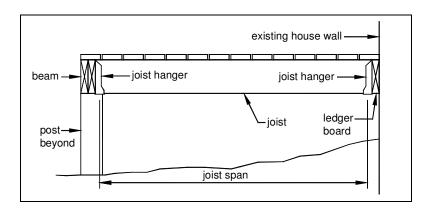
JOIST SPAN WITH OVERHANG - JOISTS ATTACHED TO SIDE OF BEAM
